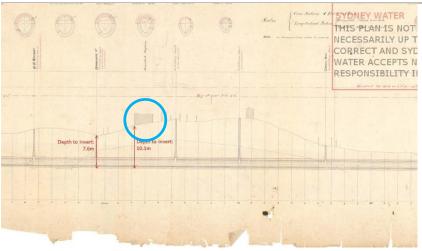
1888 survey plan for construction of BOOS sewer, showing vertical elevations and indicative 1880s ground level.
